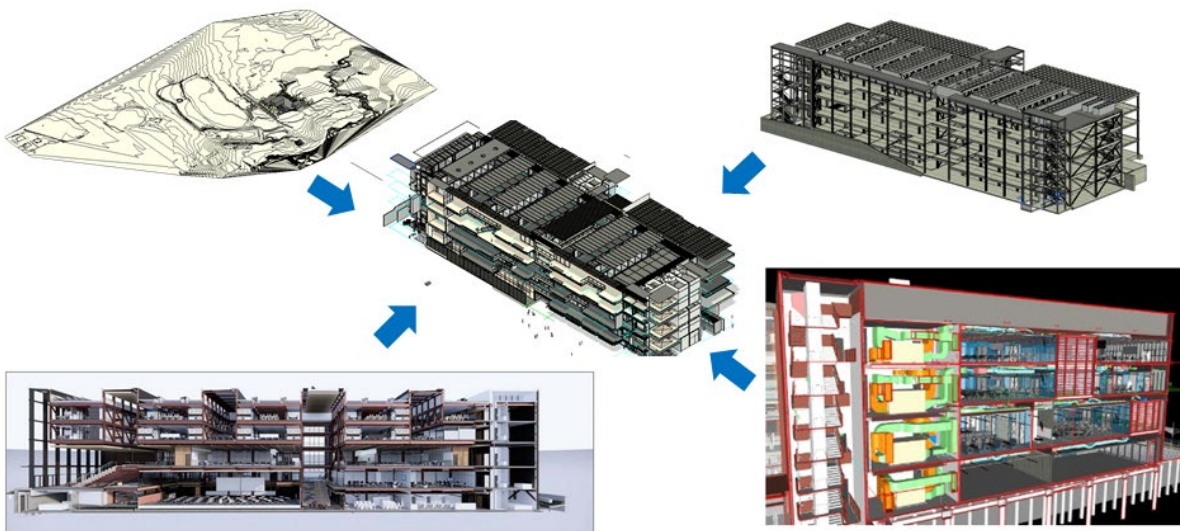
Central Revit model comprising the site data, architectural, structural, and mechanical, electrical and plumbing models
